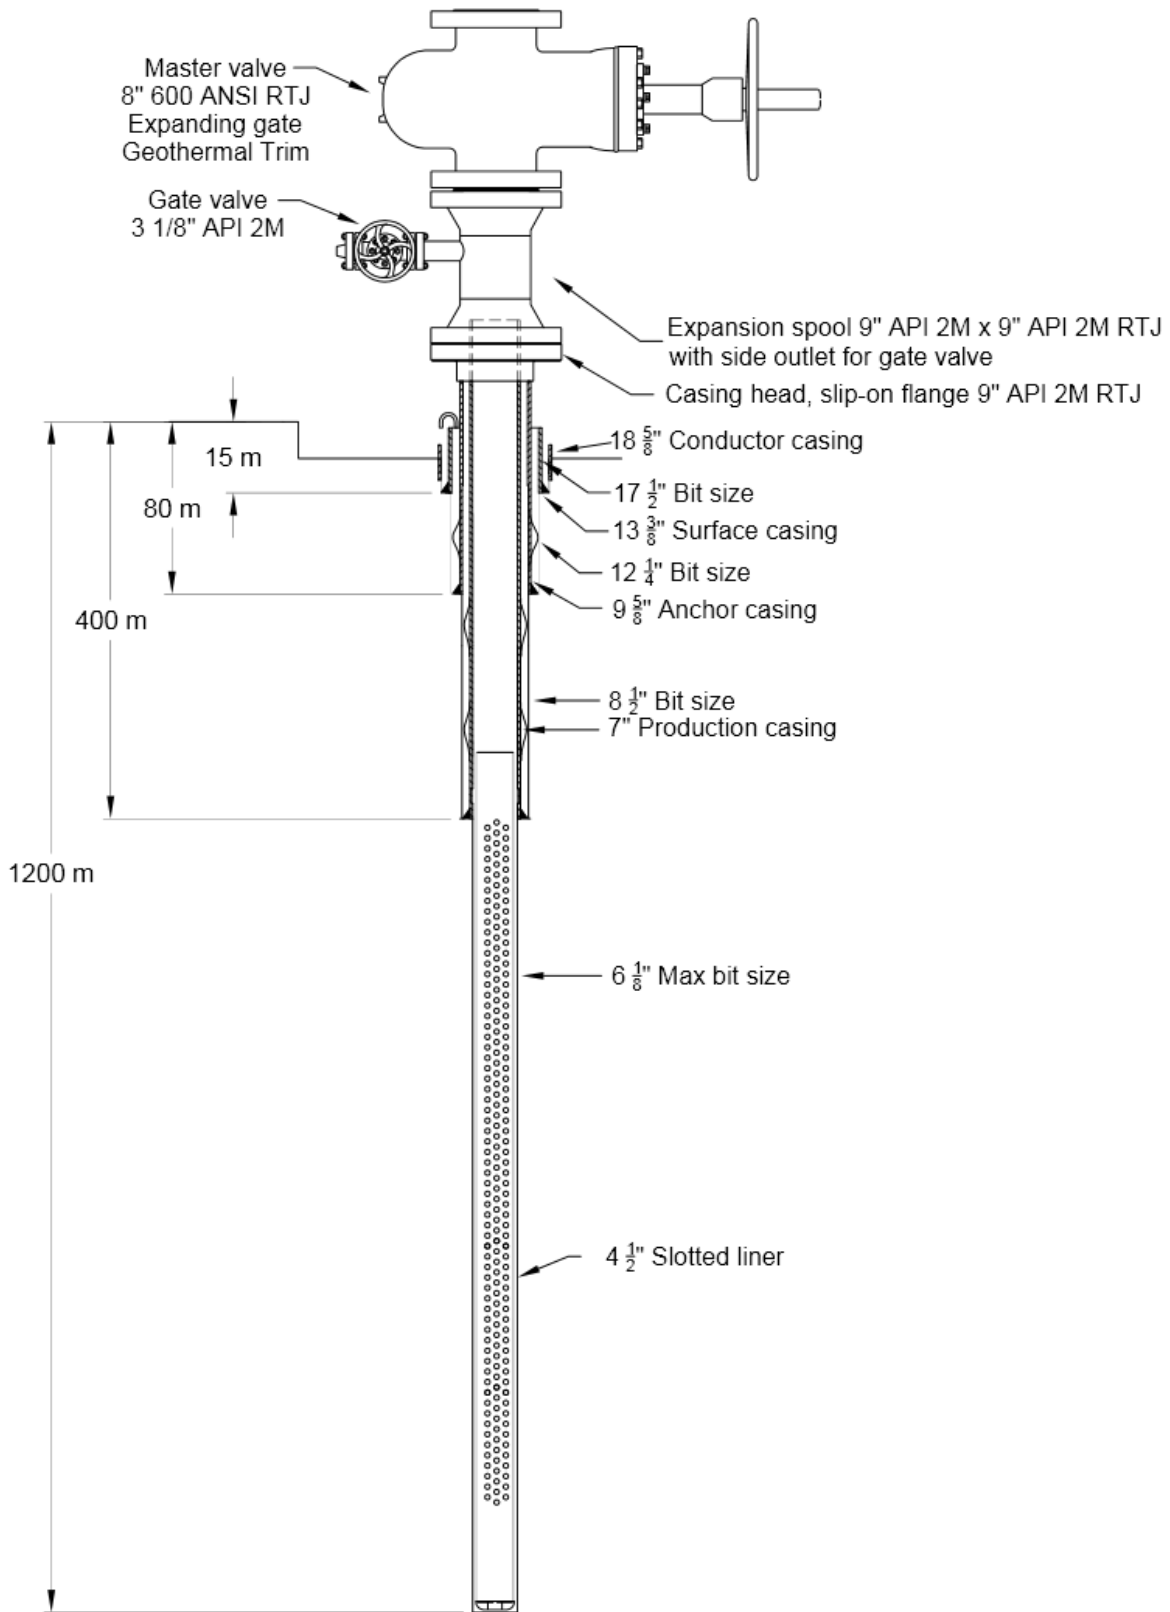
Slim hole casing program, drilled with truck mounted exploration rigs (60-100 t). The final hole size is 6 1/8". Such wells can be drilled much deeper.
